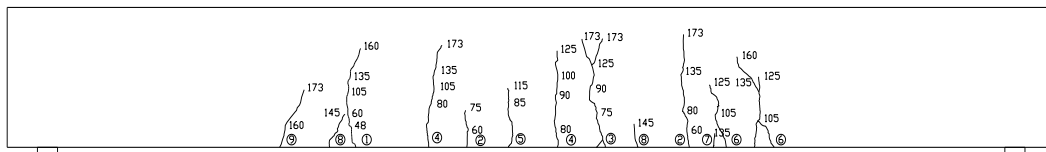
Crack distribution diagram of beam JG1 (Unit: kN)
